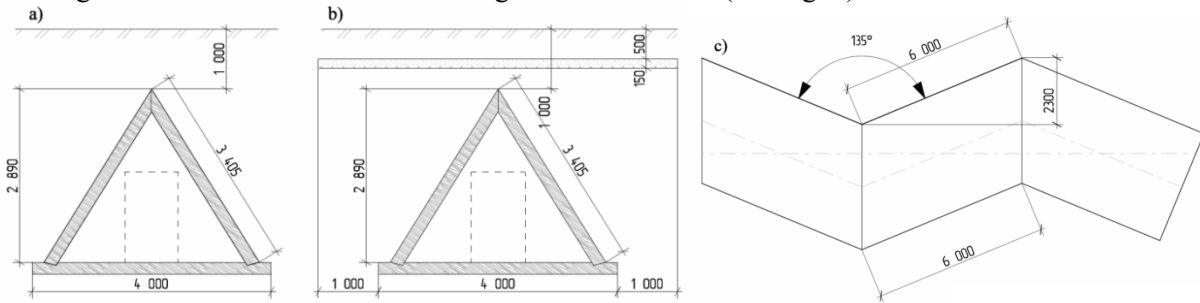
Geometry of proposed underground timber shelter: a) shelter cross-section without damper plate; b) shelter cross-section with damper plate; c) shelter layout
